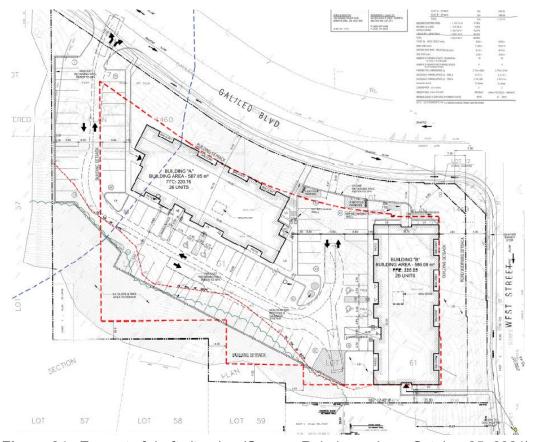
Excerpt of draft site plan (Source: Reinders + Law, October 25, 2021).
